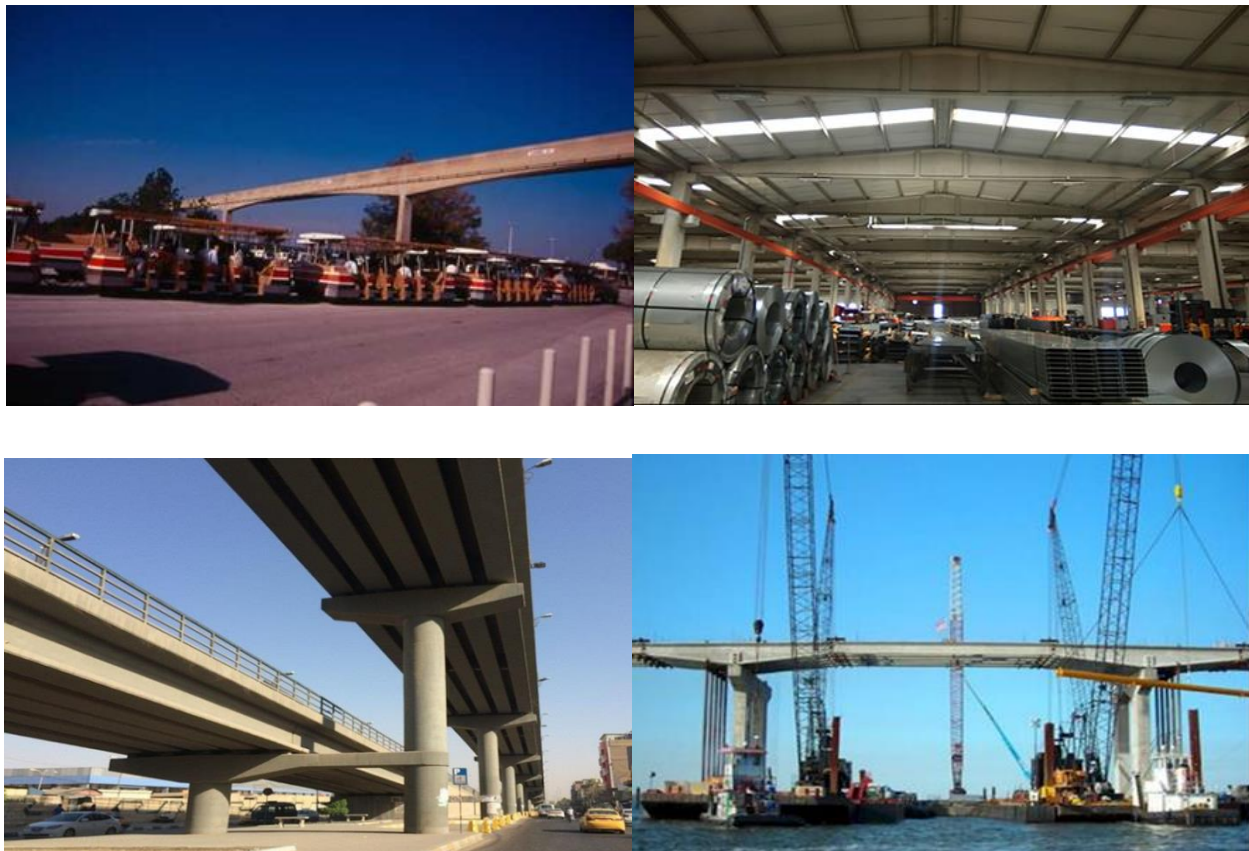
Typical non-prismatic member in building and bridge [18].
